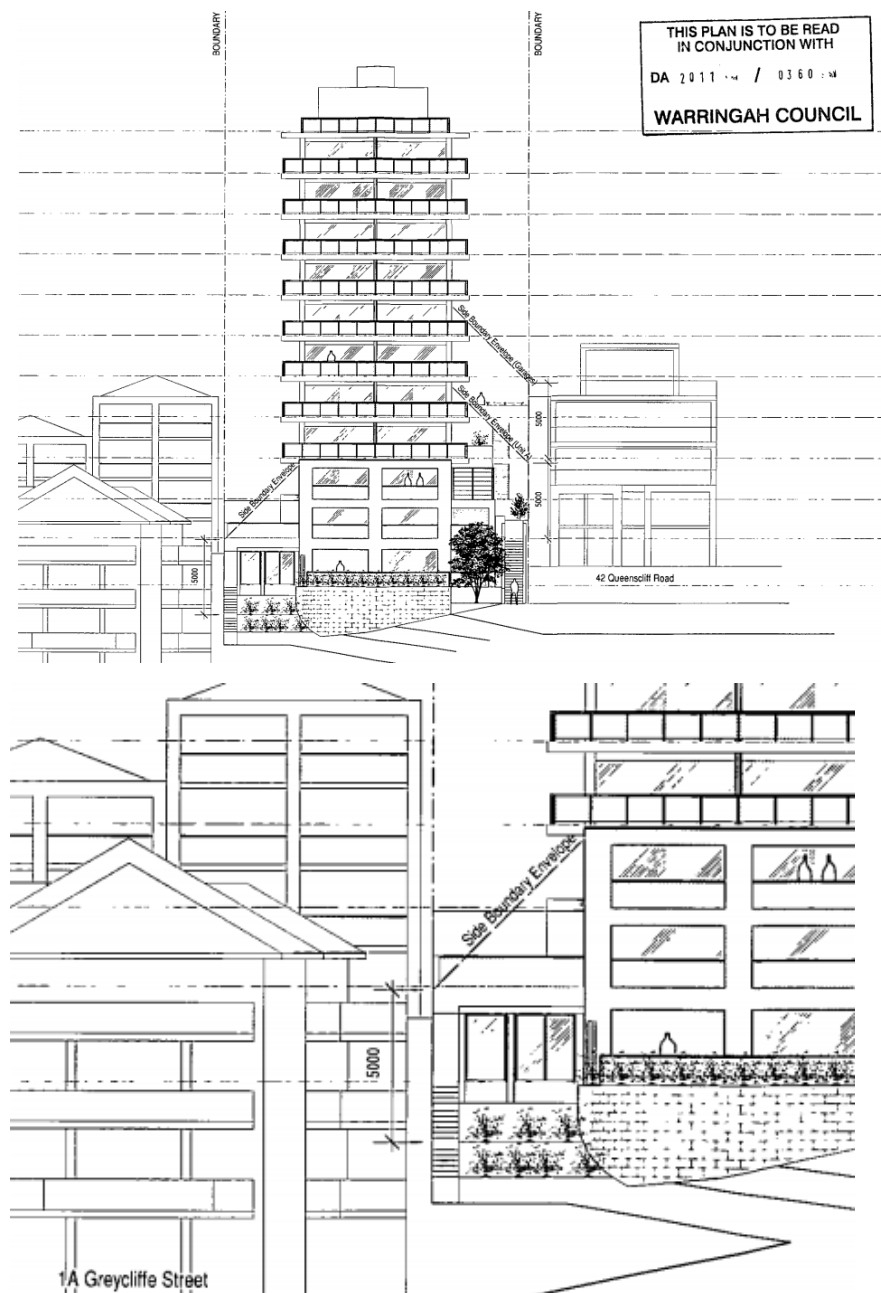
Stamped plan extract DA2011/0360 showing location of the terraced landscaping and access stairs which are being deleted as a component of this application. These stairs would have required
